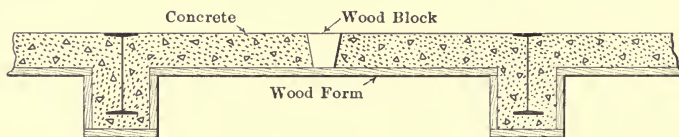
PROVISION IN CONCRETE FLOOR FOR OUTLET.
